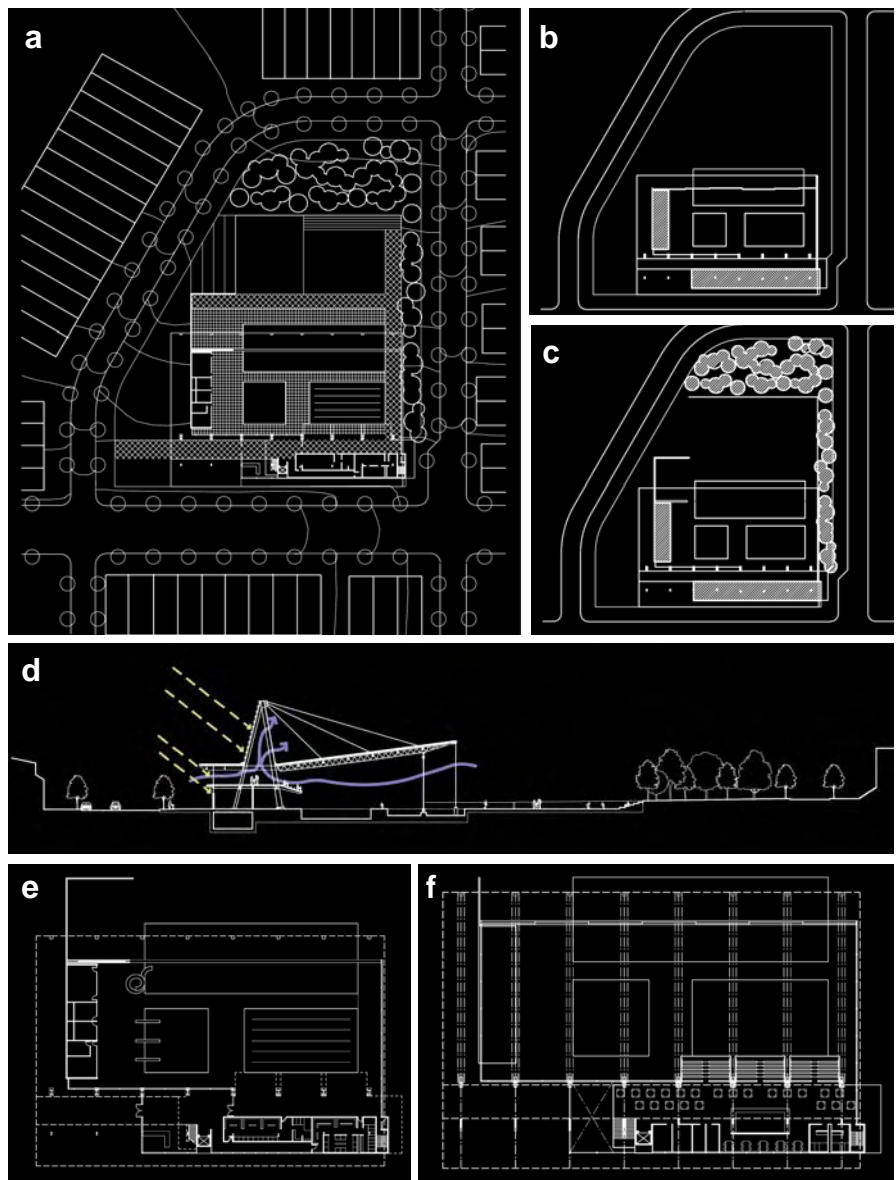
(a) Site plan; (b) spatial enclosure; (c) spatial extension; (d) site section; (e) ground floor plan; and (f) second floor plan.
